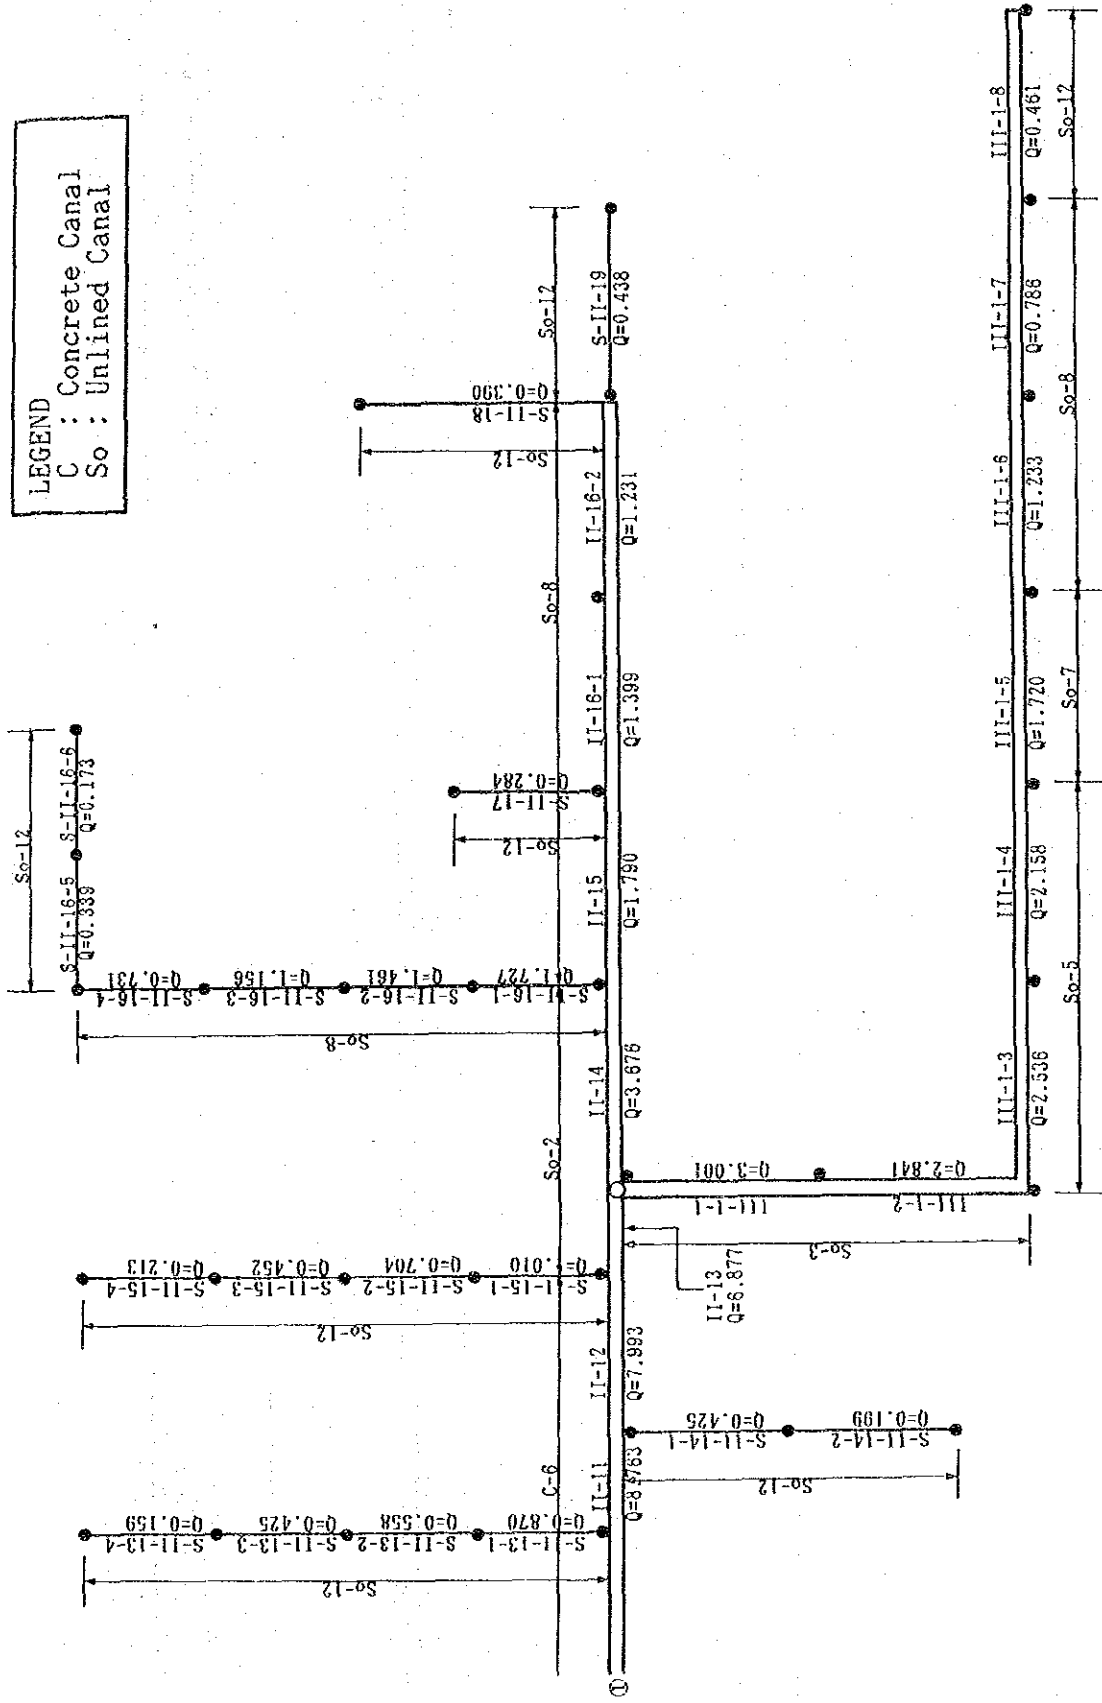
(6) IRRIGATION SYSTEM (Sheet 6)
